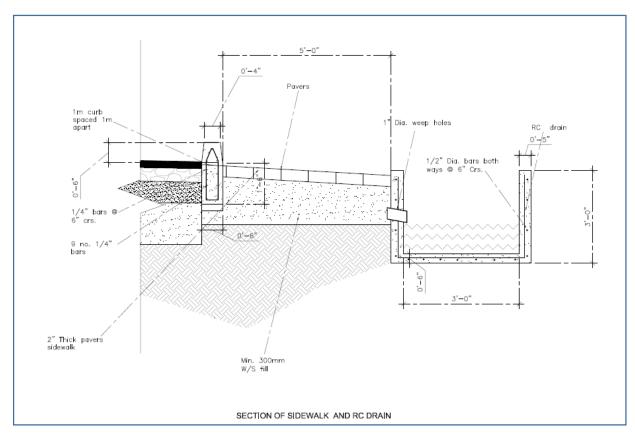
Cross Sectional view of the Sidewalks and Reinforced Concrete Drains²
